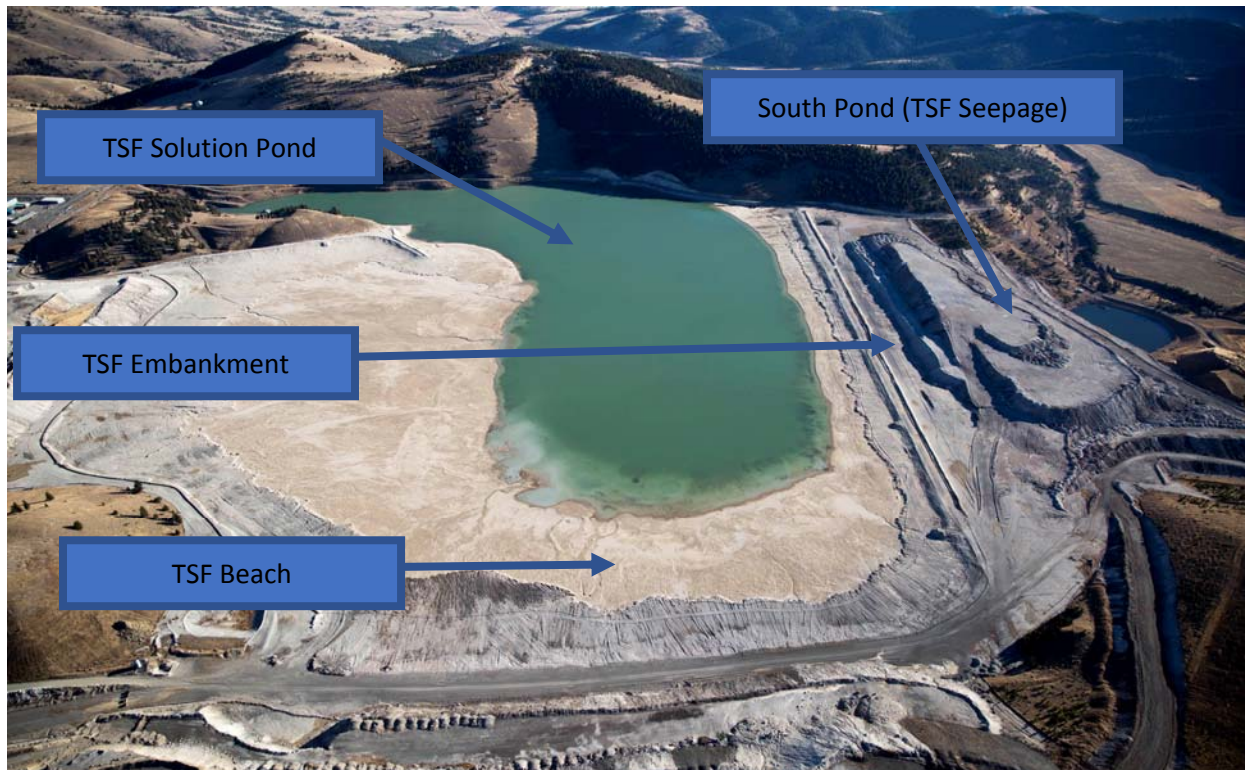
Montana Tunnels Tailings Storage Facility. (Photo by Christopher Boyer)
